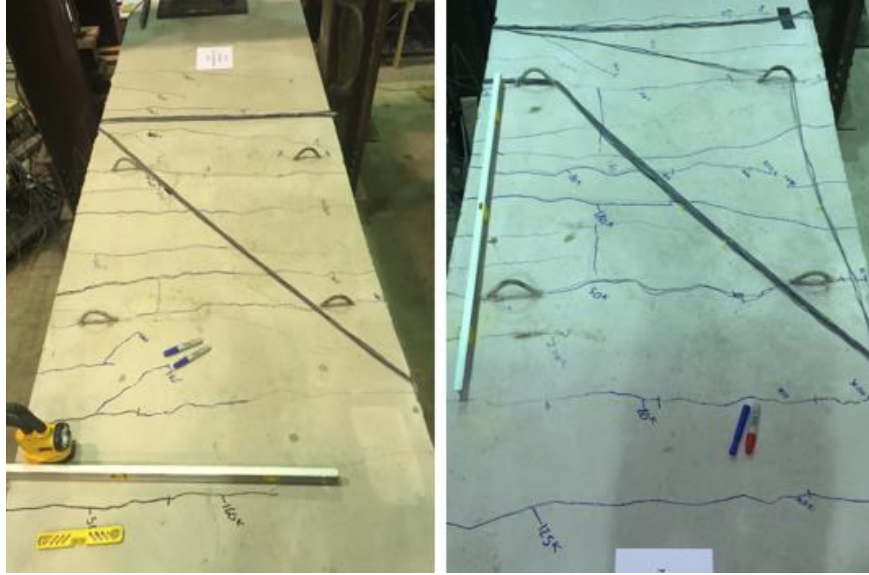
Concrete Crack Patterns at the Deck Surface.
